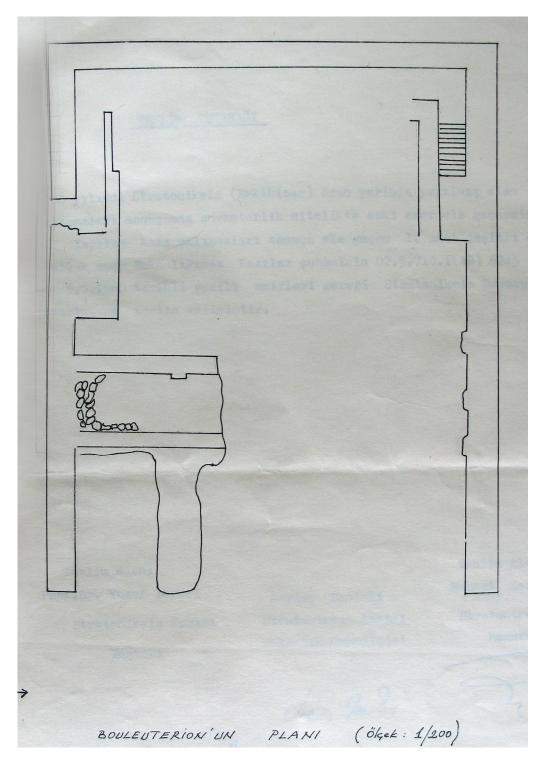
The plan layout of Bouleuterion (Archeological excavation reports)
